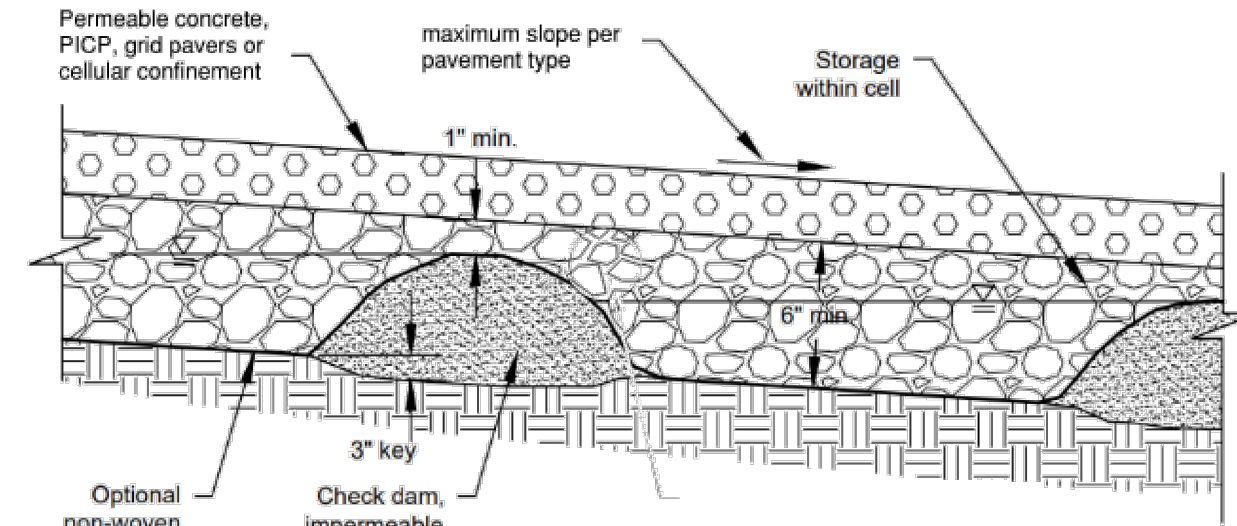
(b): Lateral Flow Barrier example (after [Stormwater Guidebook, Permeable Pavement Systems.pdf \(dc.gov\)](#))
